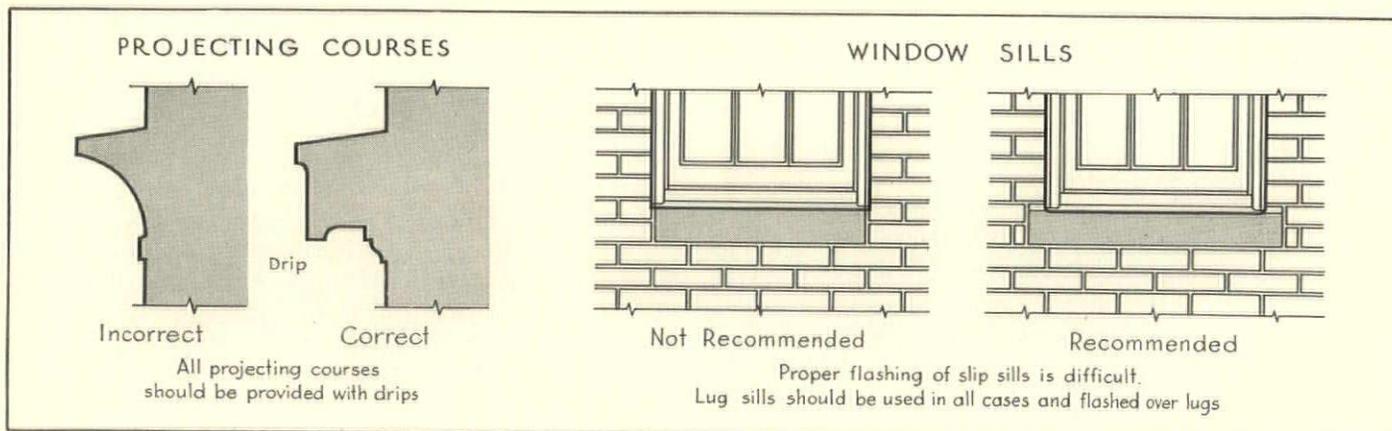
Important design details are provision of drips on projecting courses, use of lug sills with proper flashings, and provision for adequate caulking of window and door frames
